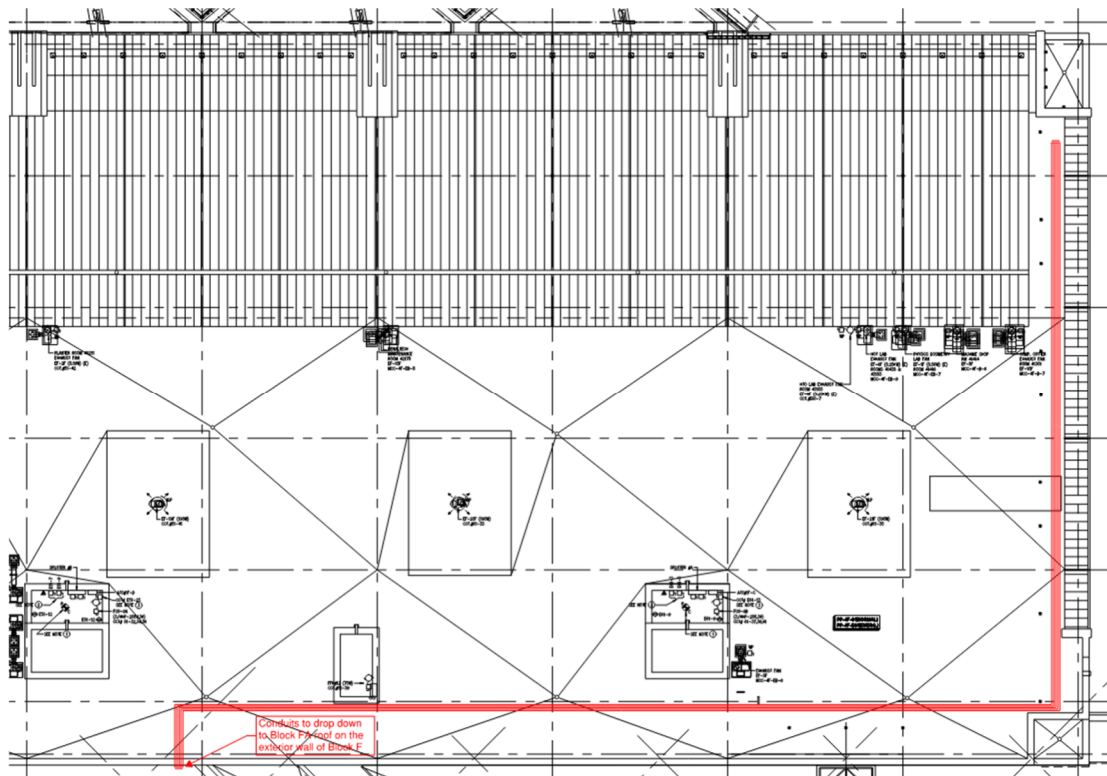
Proposed conduit runs on the roof
